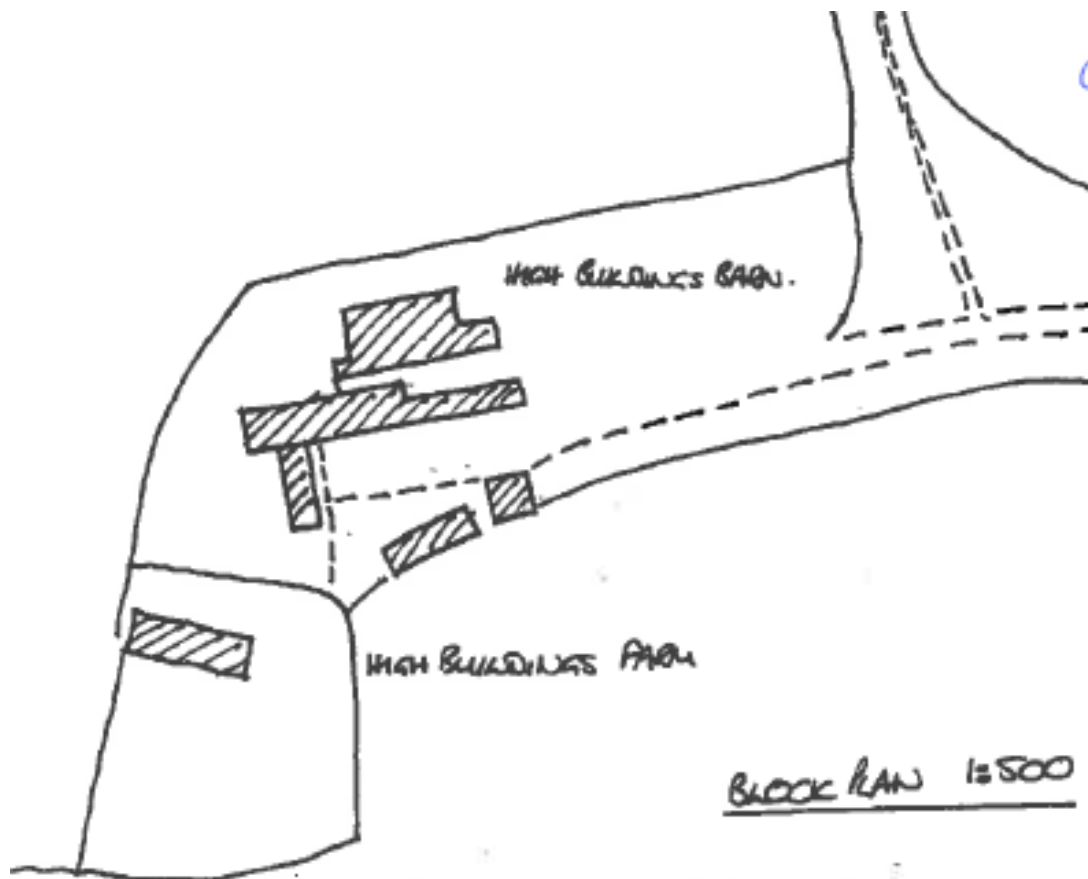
A sketch plan showing the current arrangement of buildings on the site (from an abortive planning application made in 2000)
